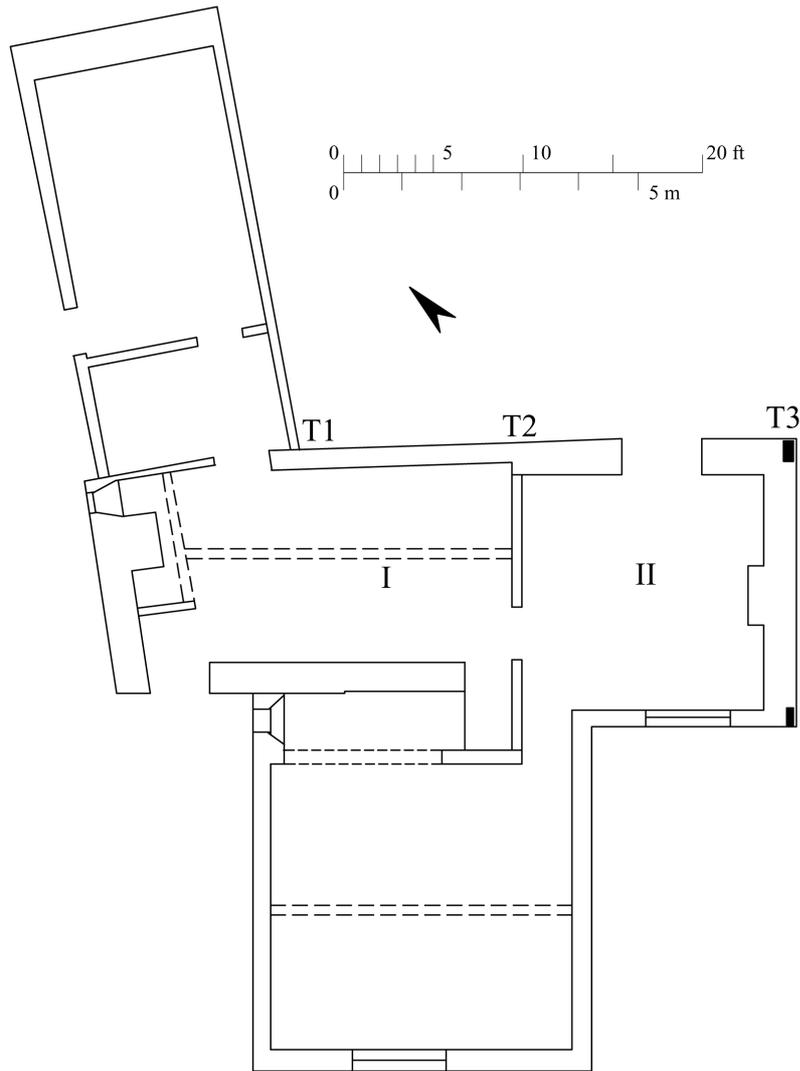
Plan, showing truss and bay numbering (scale approximate).
